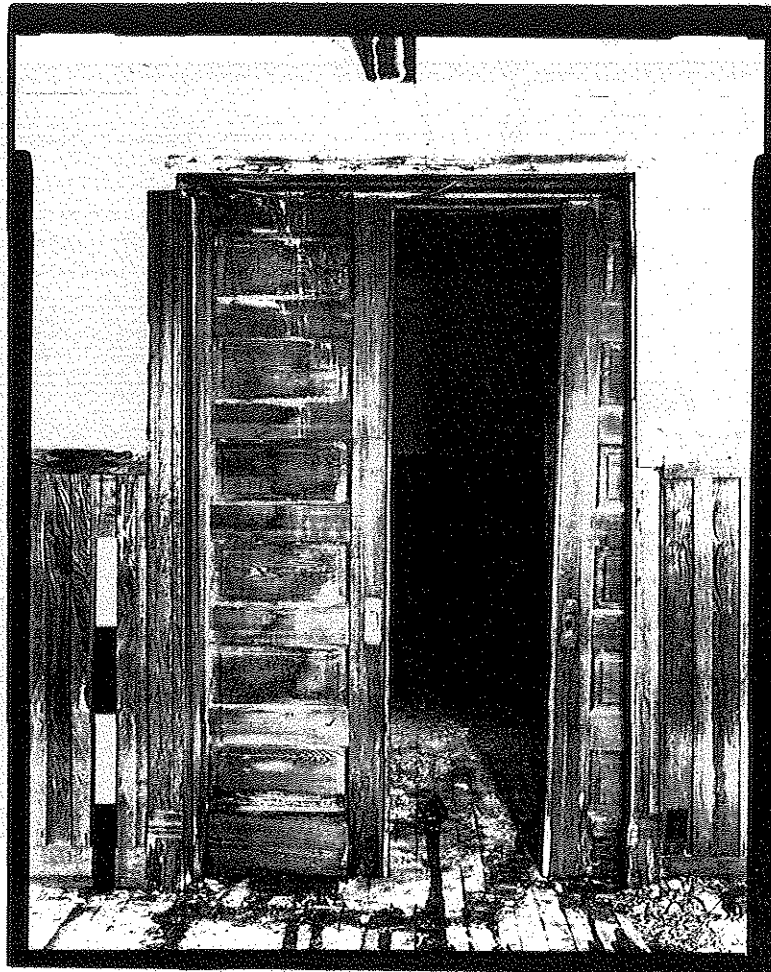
Detail of Sliding Door Construction, Eastern Front Hall of House, Morrison House.
